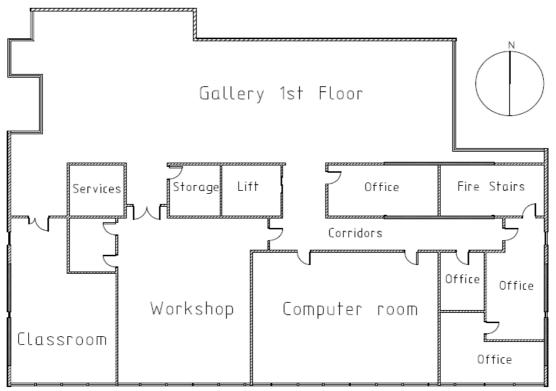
Plan section level 1 and level 2 of the Arts and Media building.
